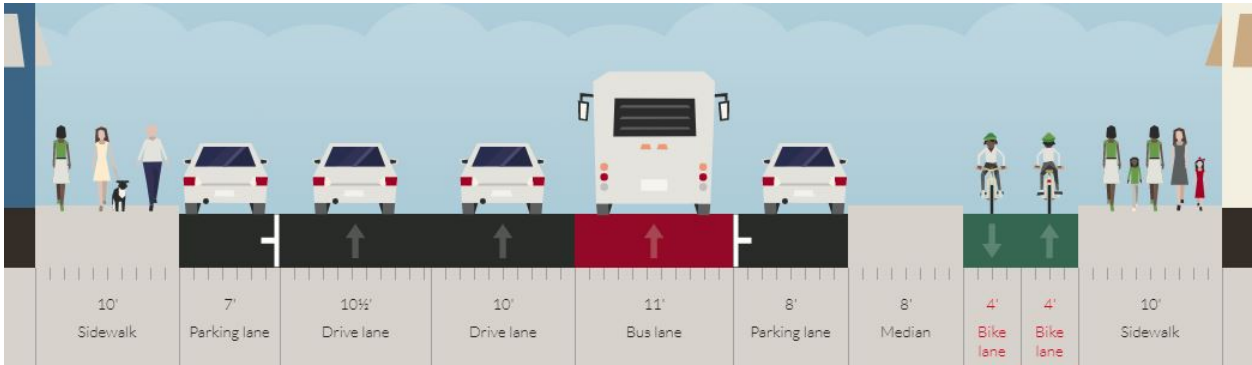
Typical Cross Section of Folsom Street between 6th Street and 5th Street, looking east
